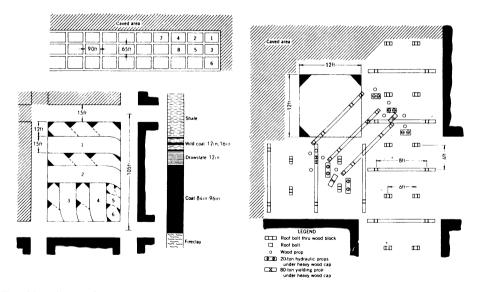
Split-and-fender pillaring with ripper-type continuous miner in Pittsburgh coal bed using bolts for roof support, hydraulic props for break props, and yielding-type steel props for cribs.⁽⁴⁾
